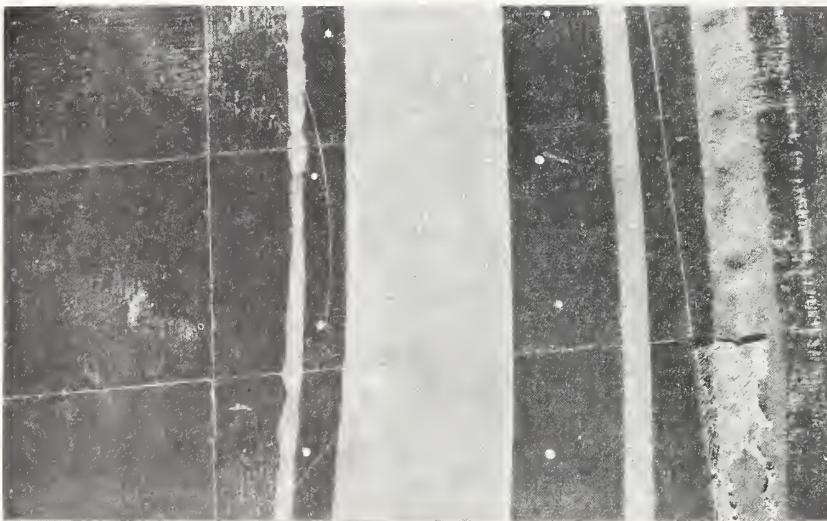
Asphalt and pitch mastic felt-base tile on concrete subfloor (test panel 9R).
